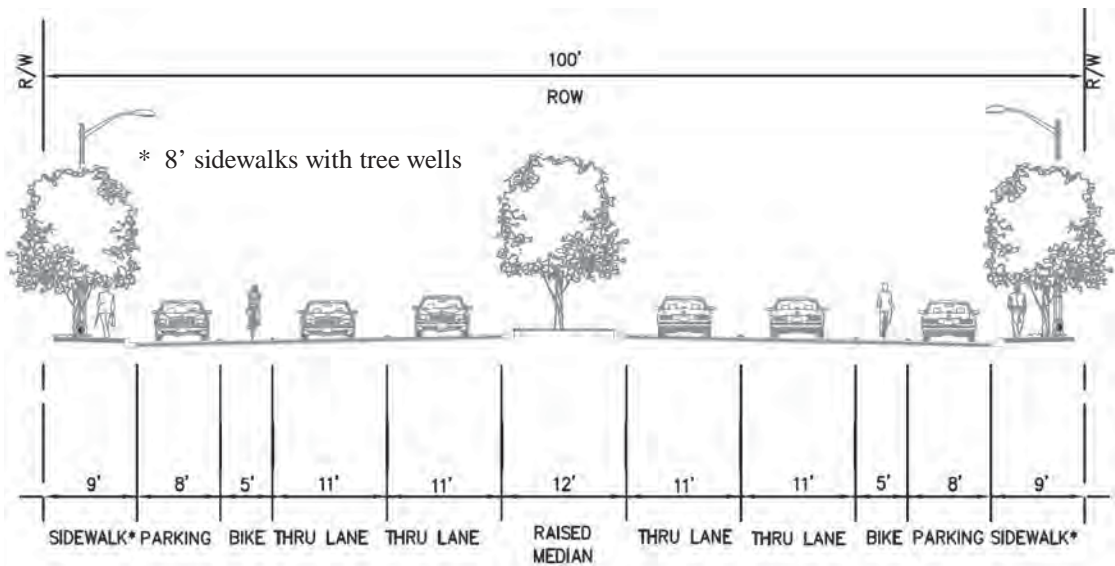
Proposed Cross Section, Broadway Between C Street and L Street
